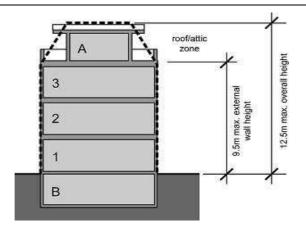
Residential 2(c1) zone height controls – pitched roof example.
